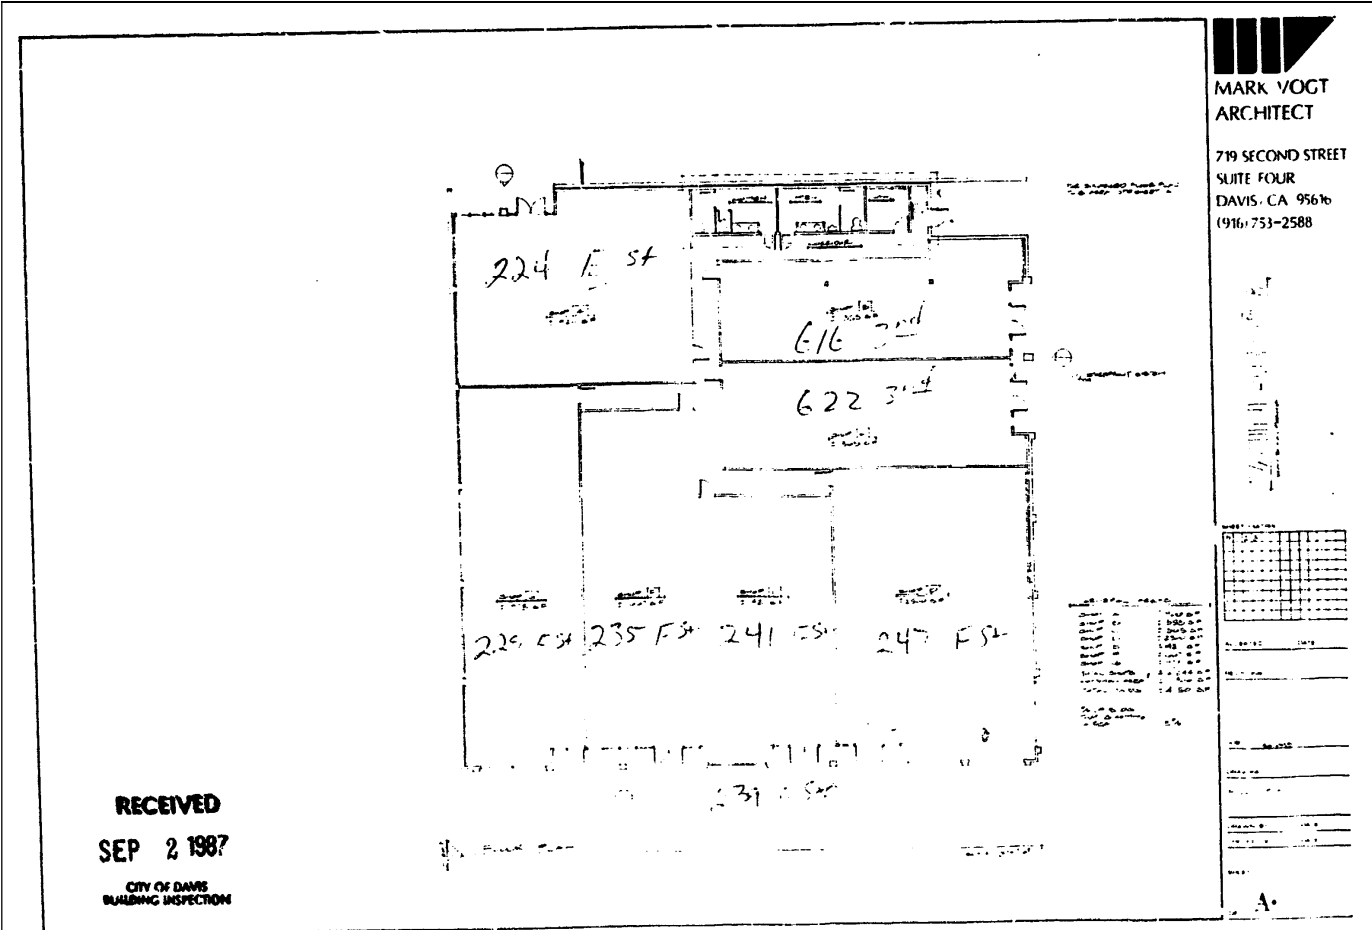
1987 Architectural plans (shows seven commercial spaces)
